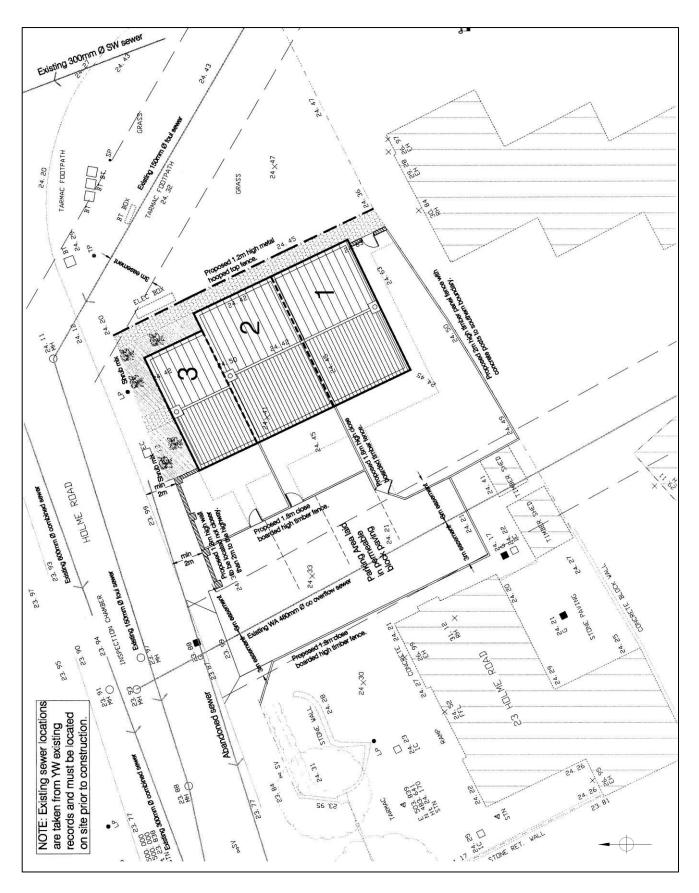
DEVELOPMENT PROPOSALS (not to scale - plan supplied by Building Design Architects)
